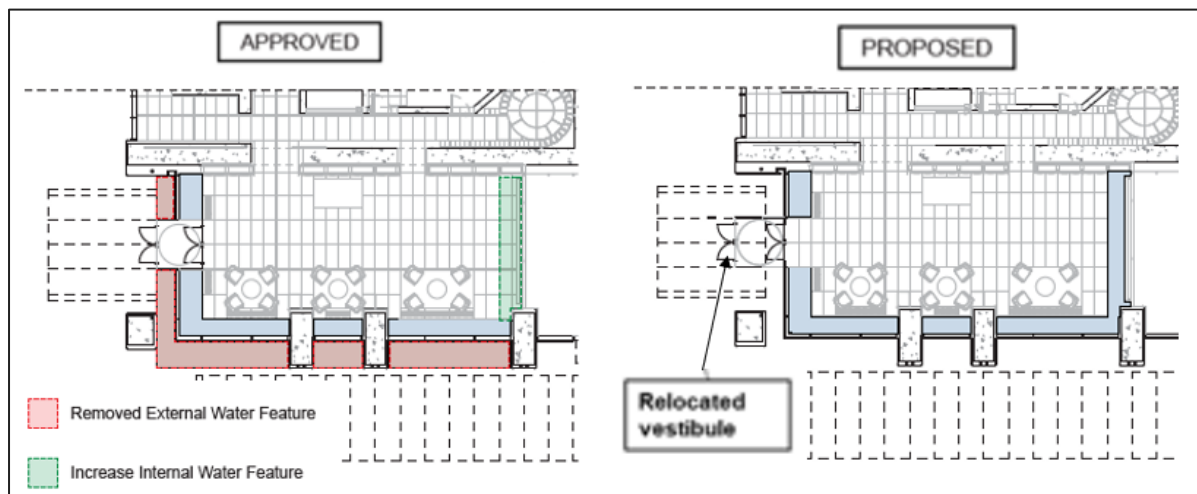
| Amendments to the ground floor residential lobby (Base source: Applicant's Design Report)
